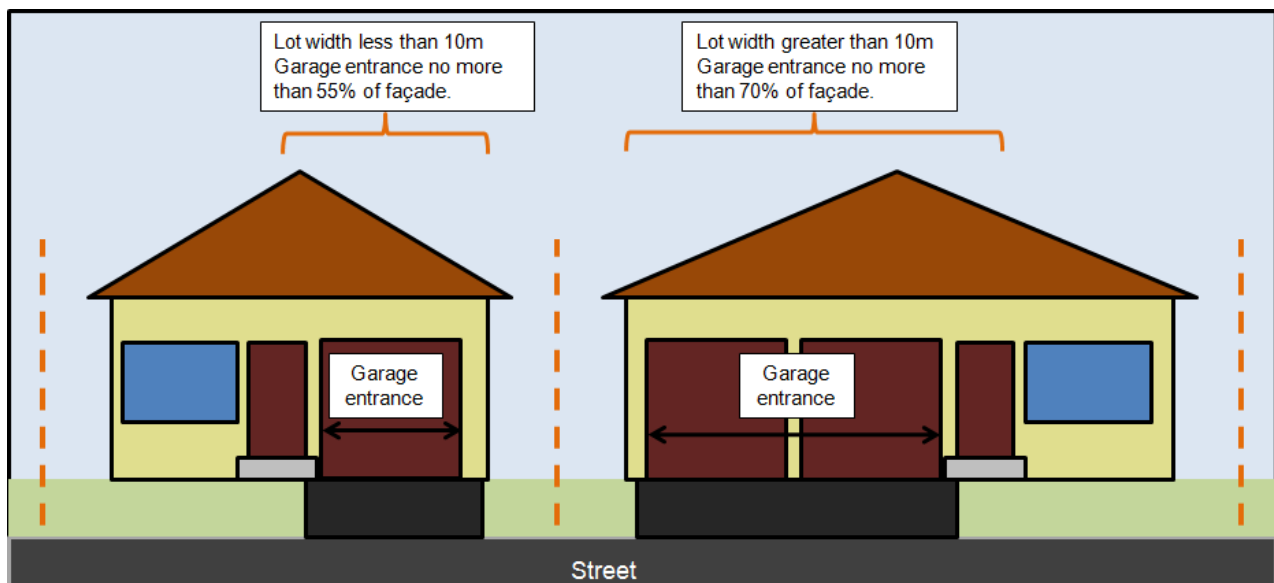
Proposed driveway regulations based on lot width, “street oriented” dwellings.
